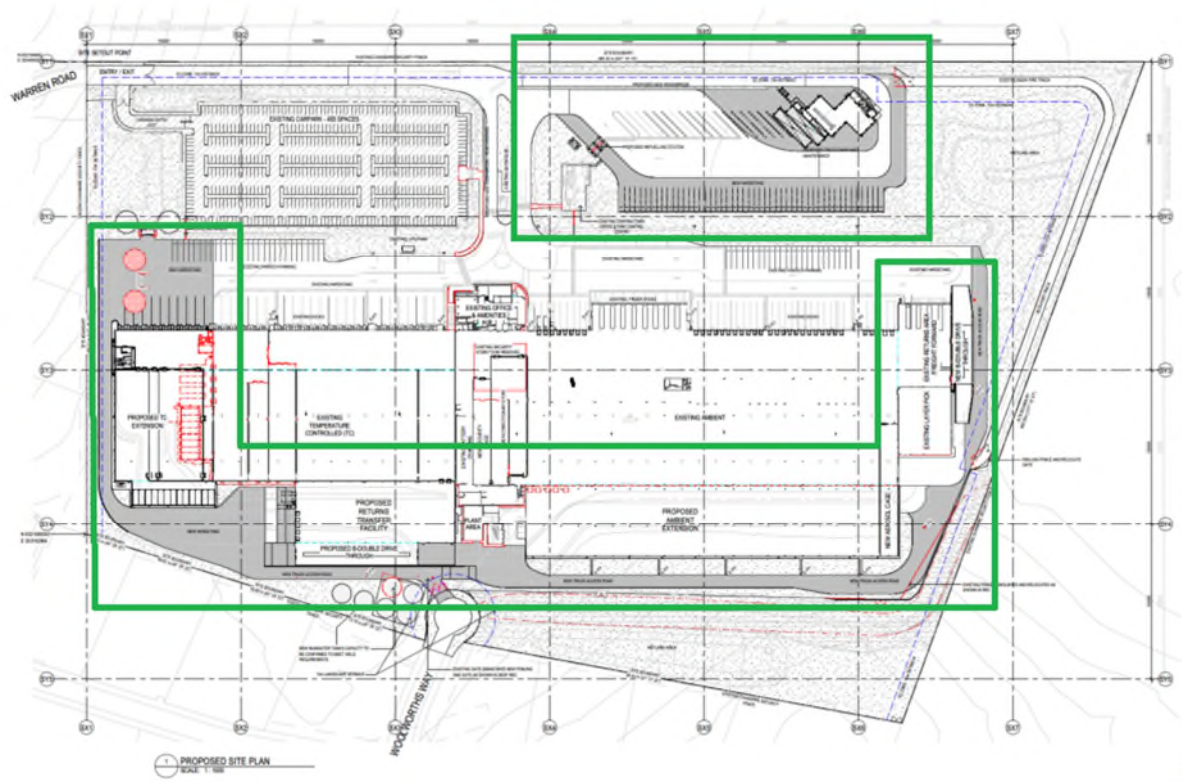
Site plan where area shown circled green indicates the extent of the proposed works. Refer to architectural drawings for more details of works proposed.
